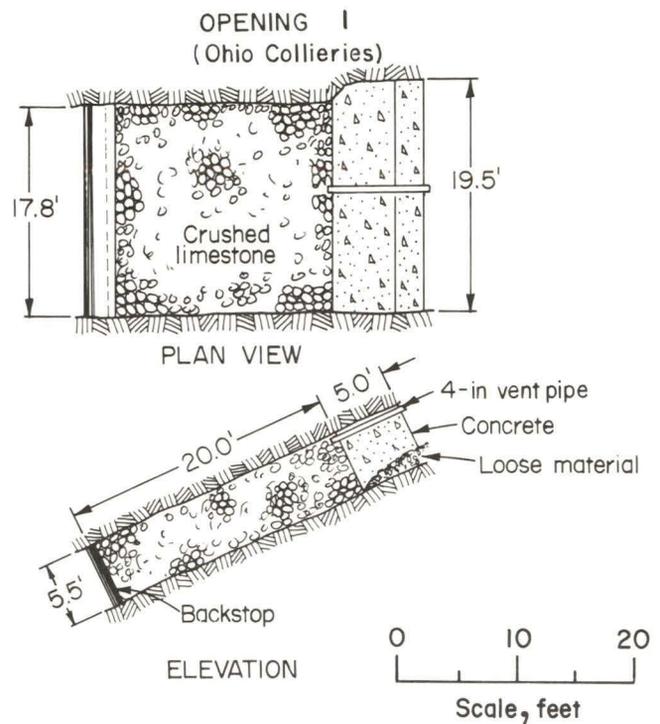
Plan view and elevation of sealed opening at Ohio Collieries No. 268 Mine, opening 1.
